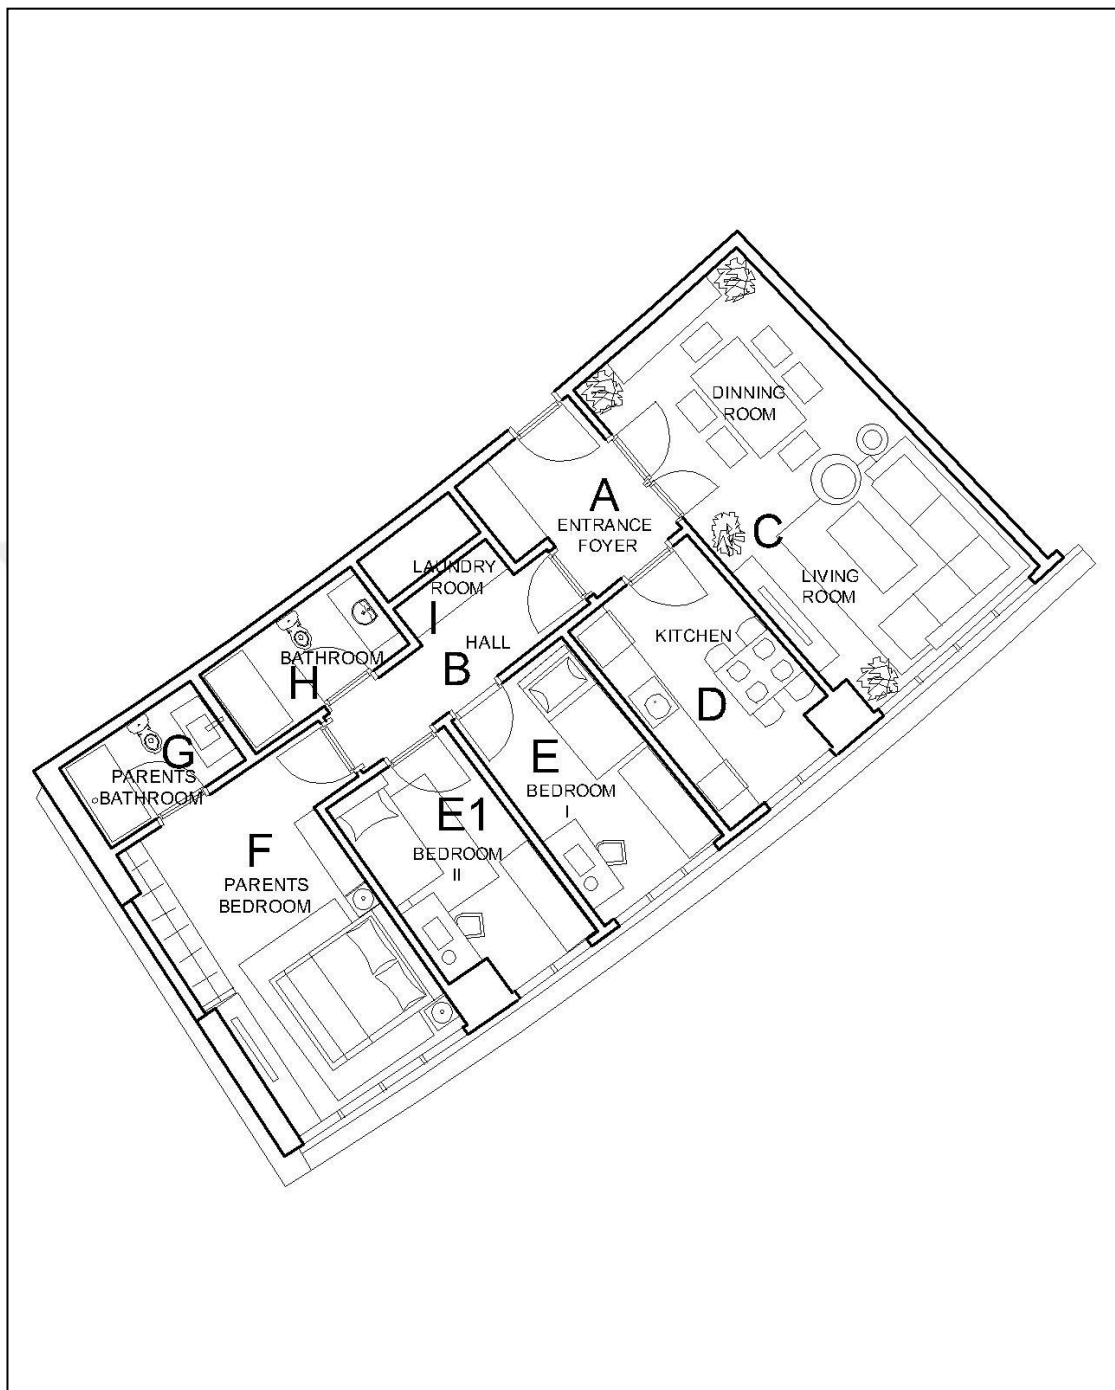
Current floor plan of residence. Standard furnishing, designed by author.
